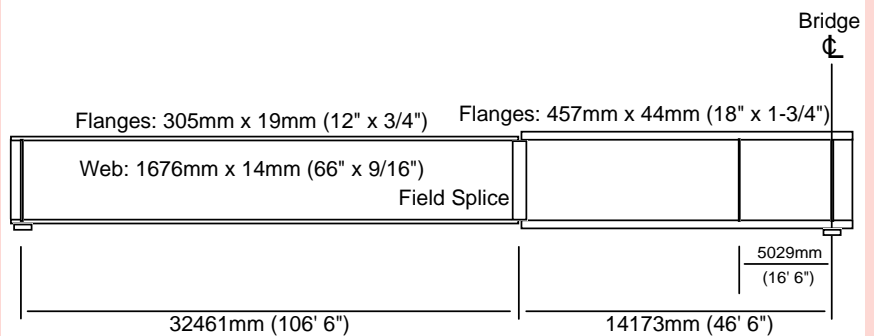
Elevation View of 8 Girder HPS Steel Bridge
